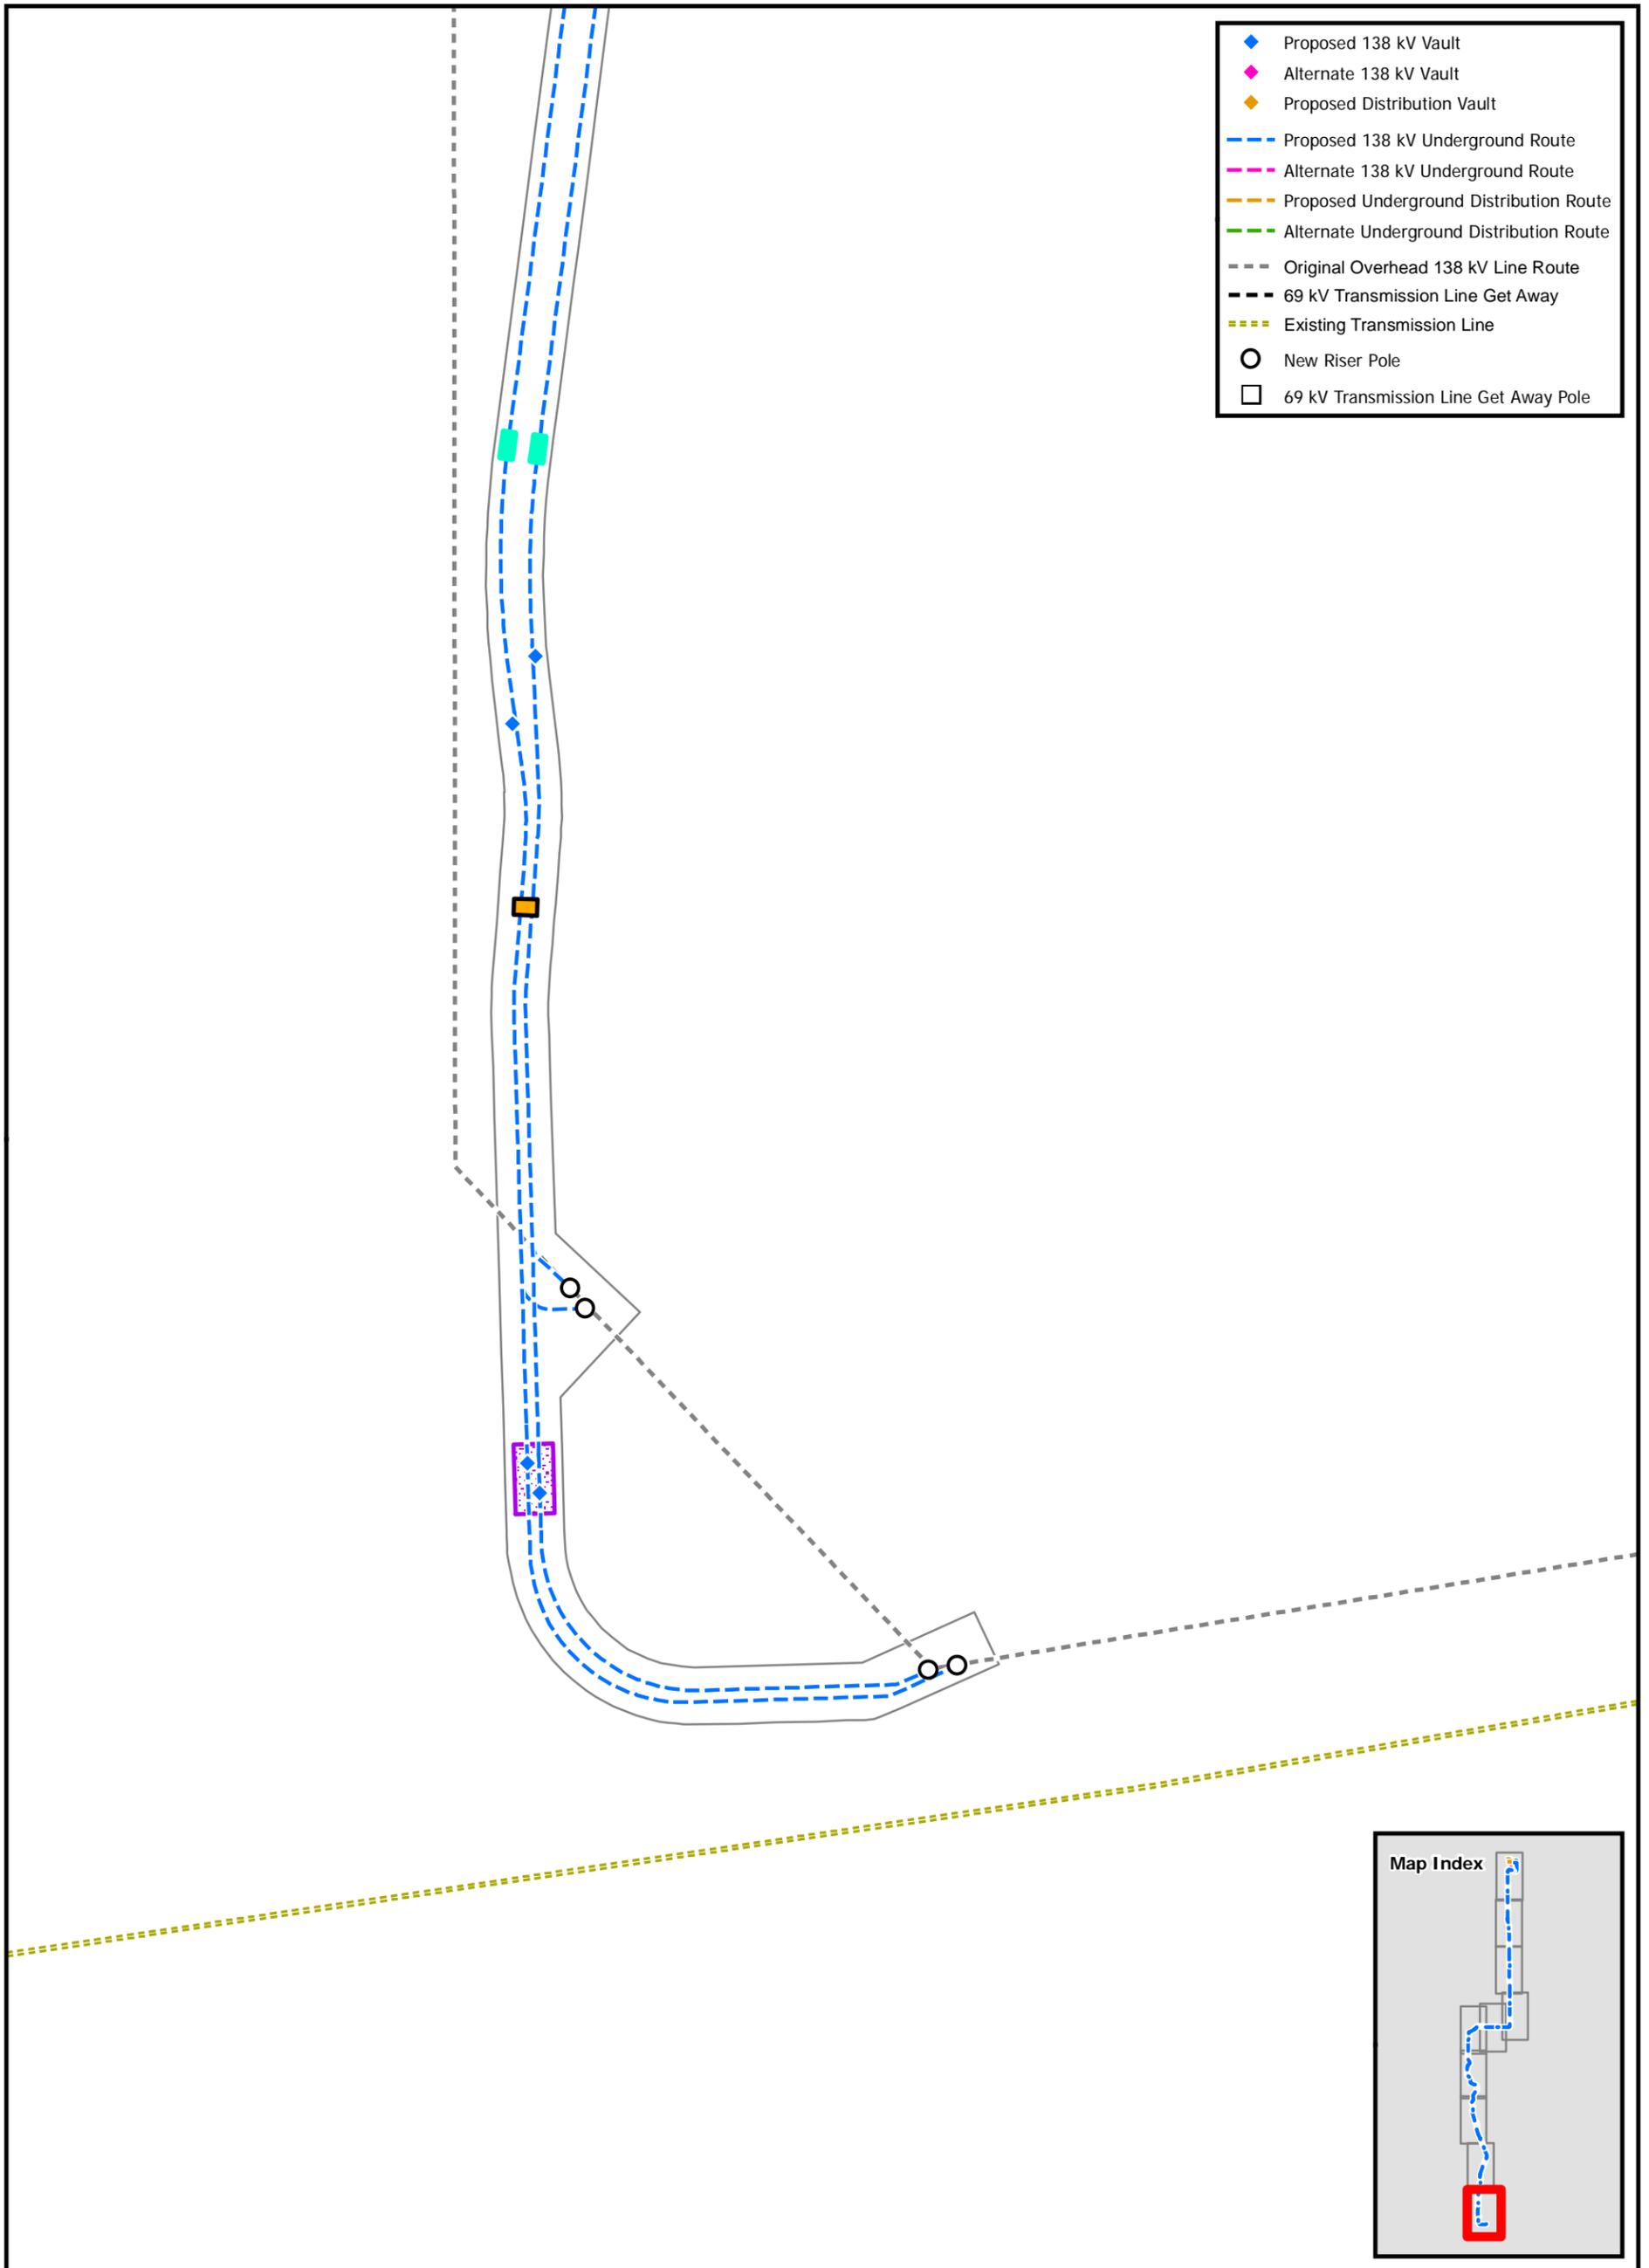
Preliminary Underground Alignment Drawing 10 of 10
